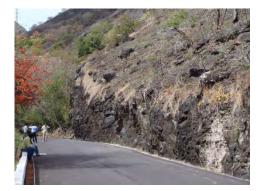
Planned location for a rockfall protection net on the side of the mountain (Source: JET)
